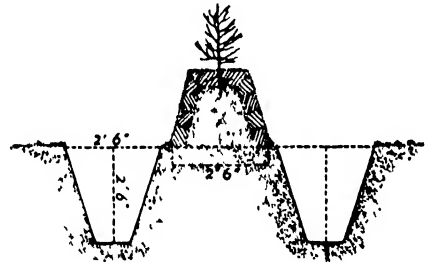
Section of Double Ditch and Bank, with Hedge on top of the Bank
